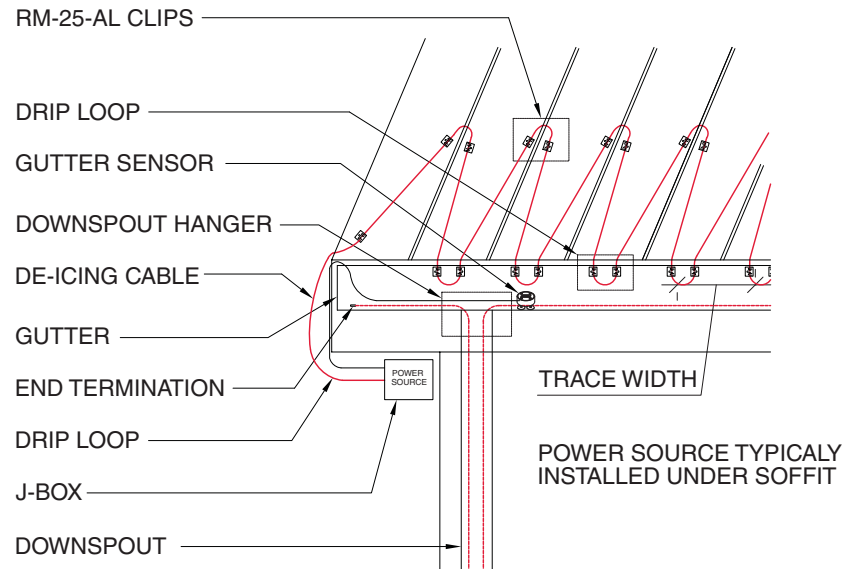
De-icing cable on sloped standing seam metal eave only. This layout typically uses RM-25-AL clips with VHB adhesive pads.
